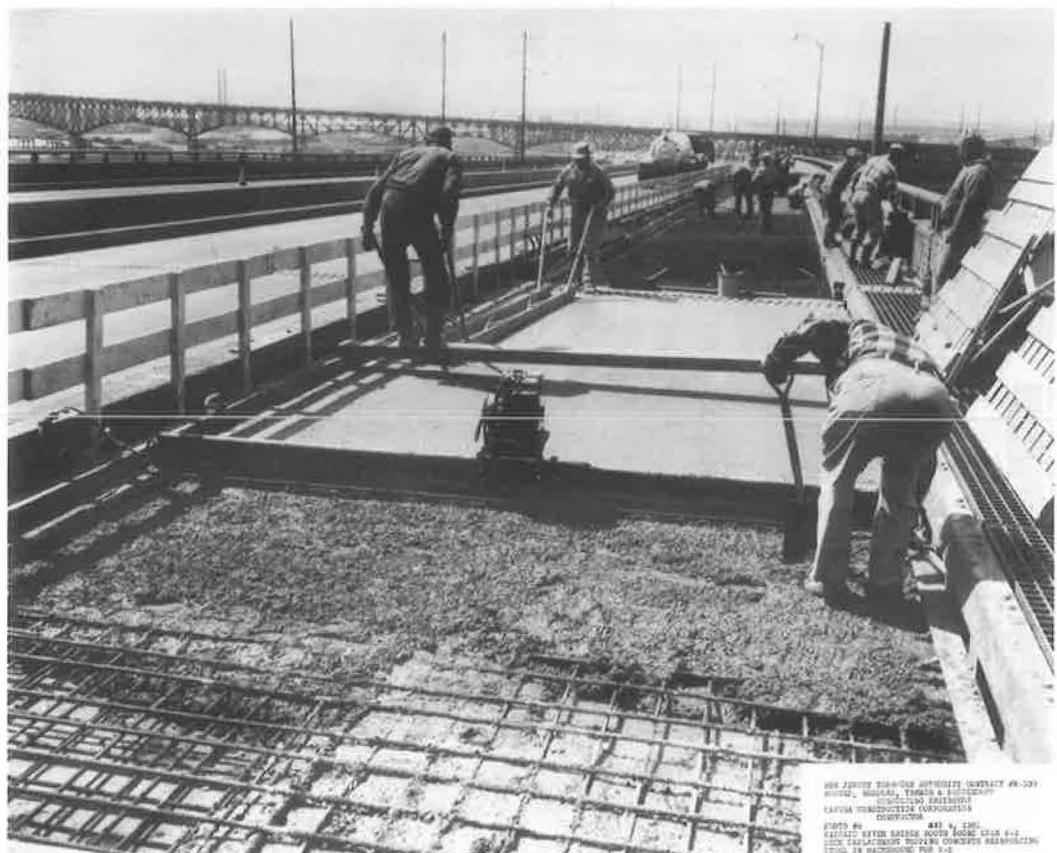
Nonshrinkage concrete being placed over fresh conventional concrete.
